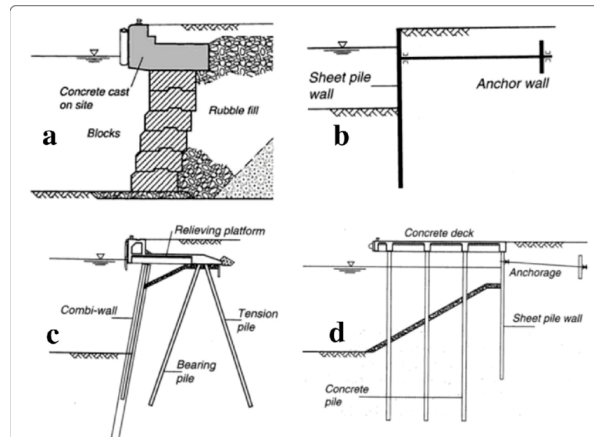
Types of Quay walls: (a) Gravity Wall, (b) Sheet Pile Wall, (c) Sheet Pile Wall with Reliving Platform and (d) Open Berth Quays [10]
